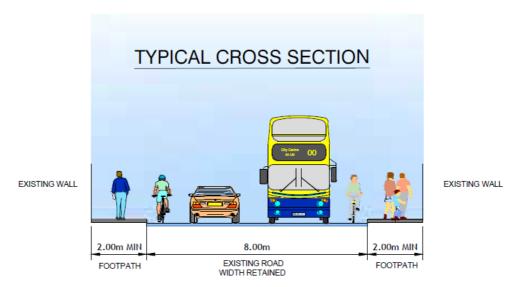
Typical Cross-Section on Kimmage Road Lower in Section 1
